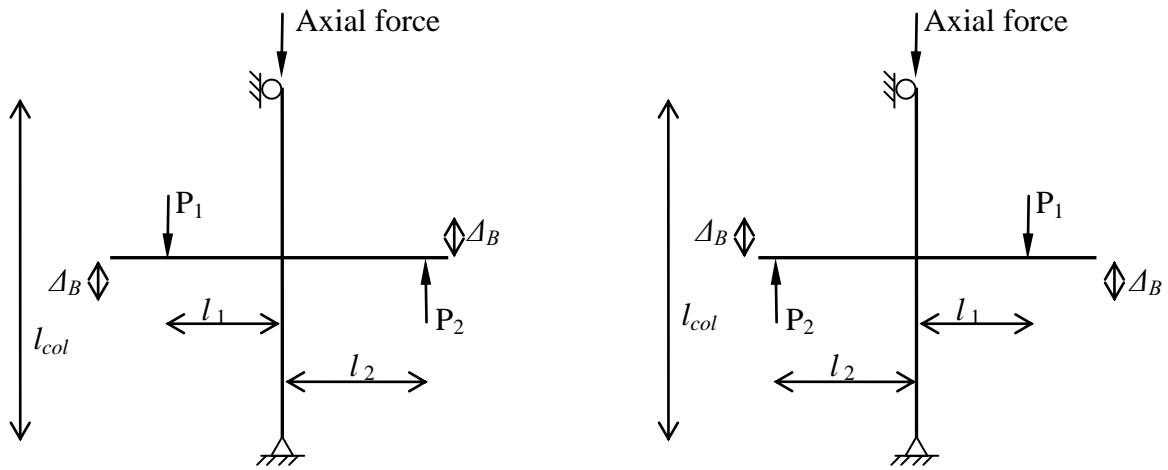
Loading arrangement of cyclic (left) and reversed-cyclic (right) loading used for the internal beam-column joint
